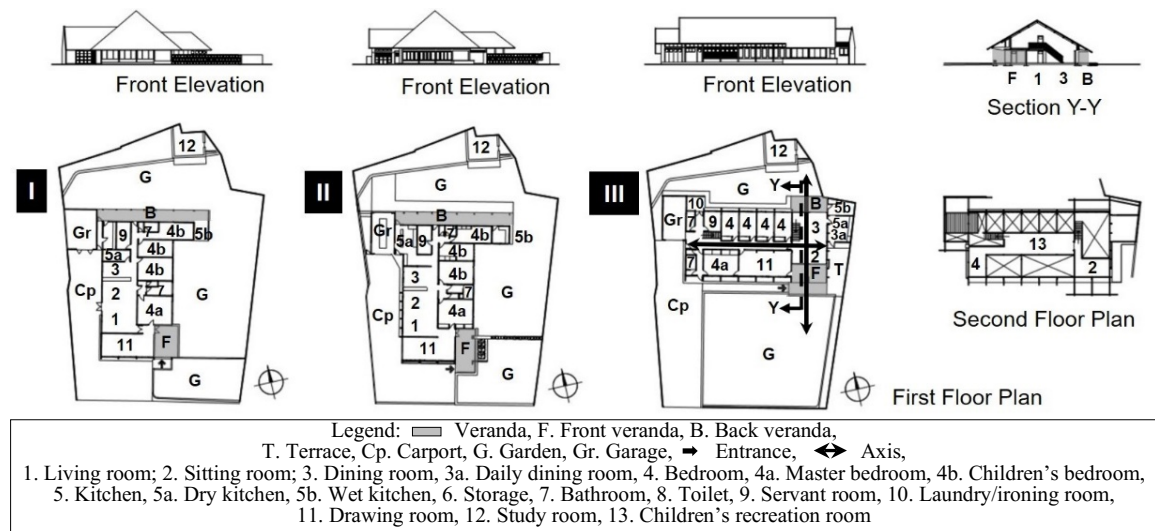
Design process of Silaban's house (1958)⁴⁾
